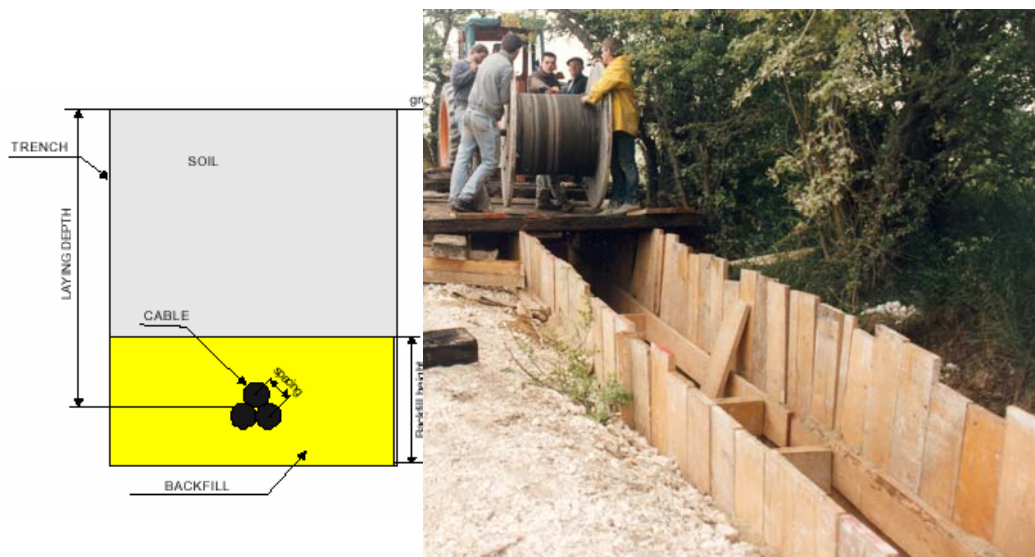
Trench cross-section and construction activity for a high voltage (66-90 kV) cable
